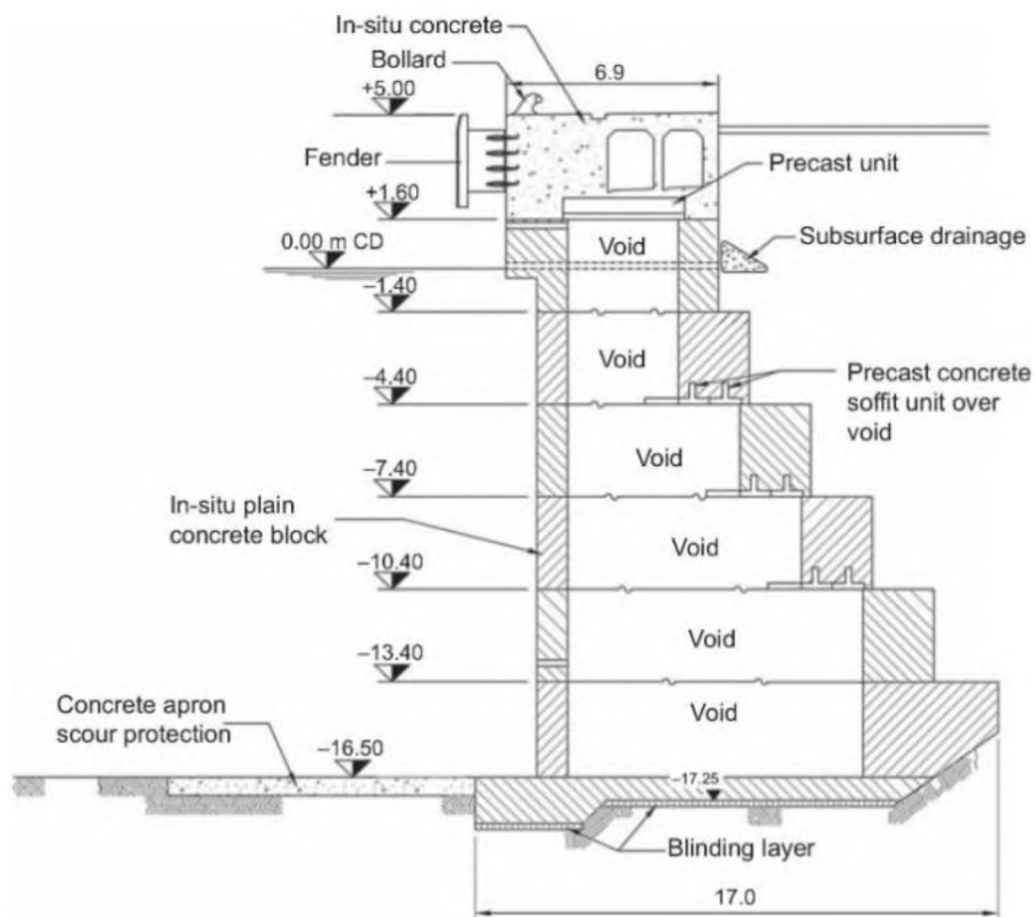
Ngqura quay walls: typical quay wall cross section (Dimensions in metres). The wall has six plain concrete blocks, and each was cast as a single pour. Reinforced concrete soffit slabs were used to span over the rear of the voids to support the wet concrete of the block above when it was cast.
